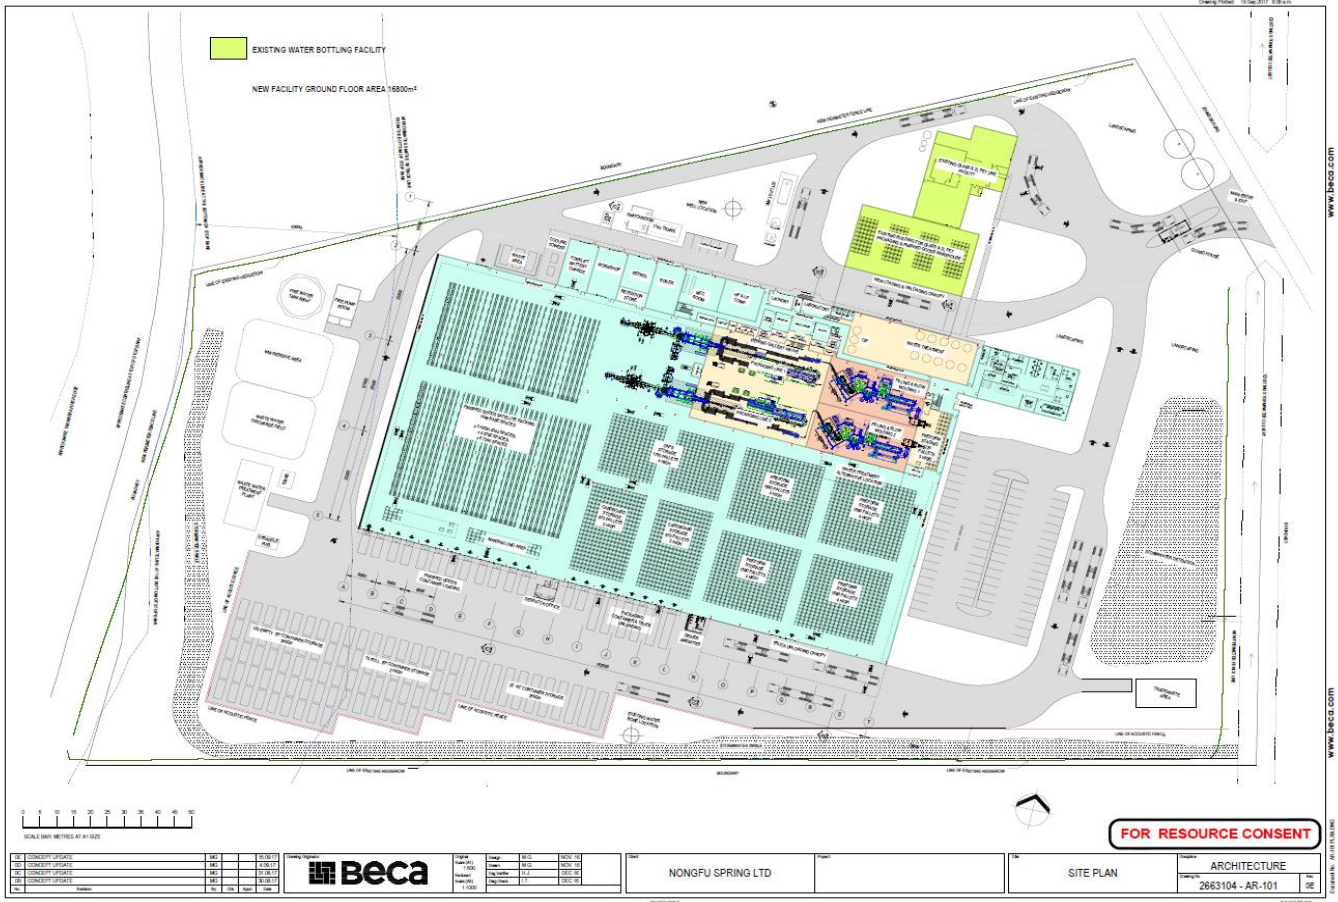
Site Plan for proposed development at 57 Johnson Road, Otakiri.
